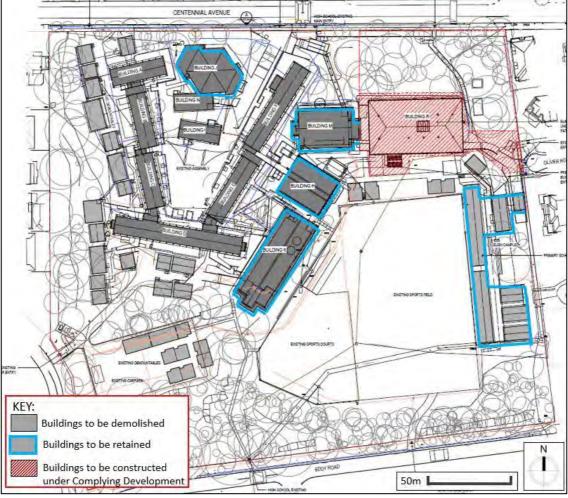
| CHS existing site plan (Base source: EIS 2020)
